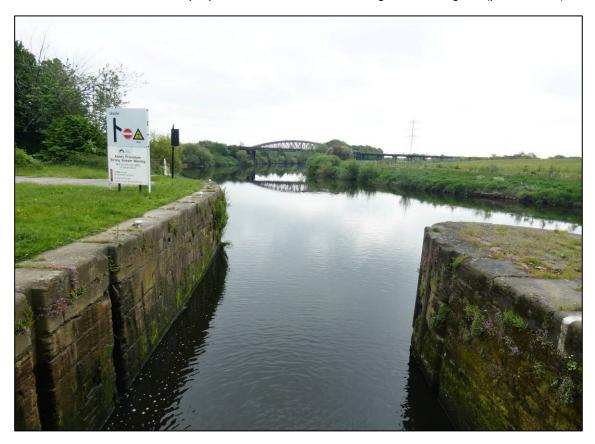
East approach from River Aire, showing 1878 railway bridge, looking E (photo 1/741).
